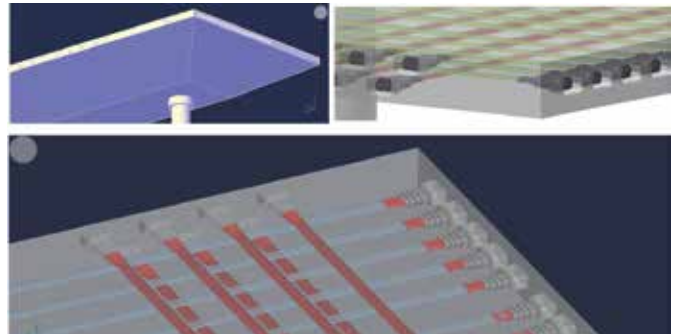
Tight spacing of the banded PT tendons made it necessary to weave the PT tendons and configure the anchors in a zigzag layered pattern
